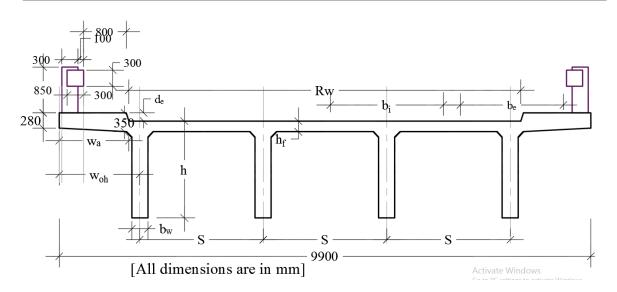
Cross Sectional Model of T-Girder Bridge
